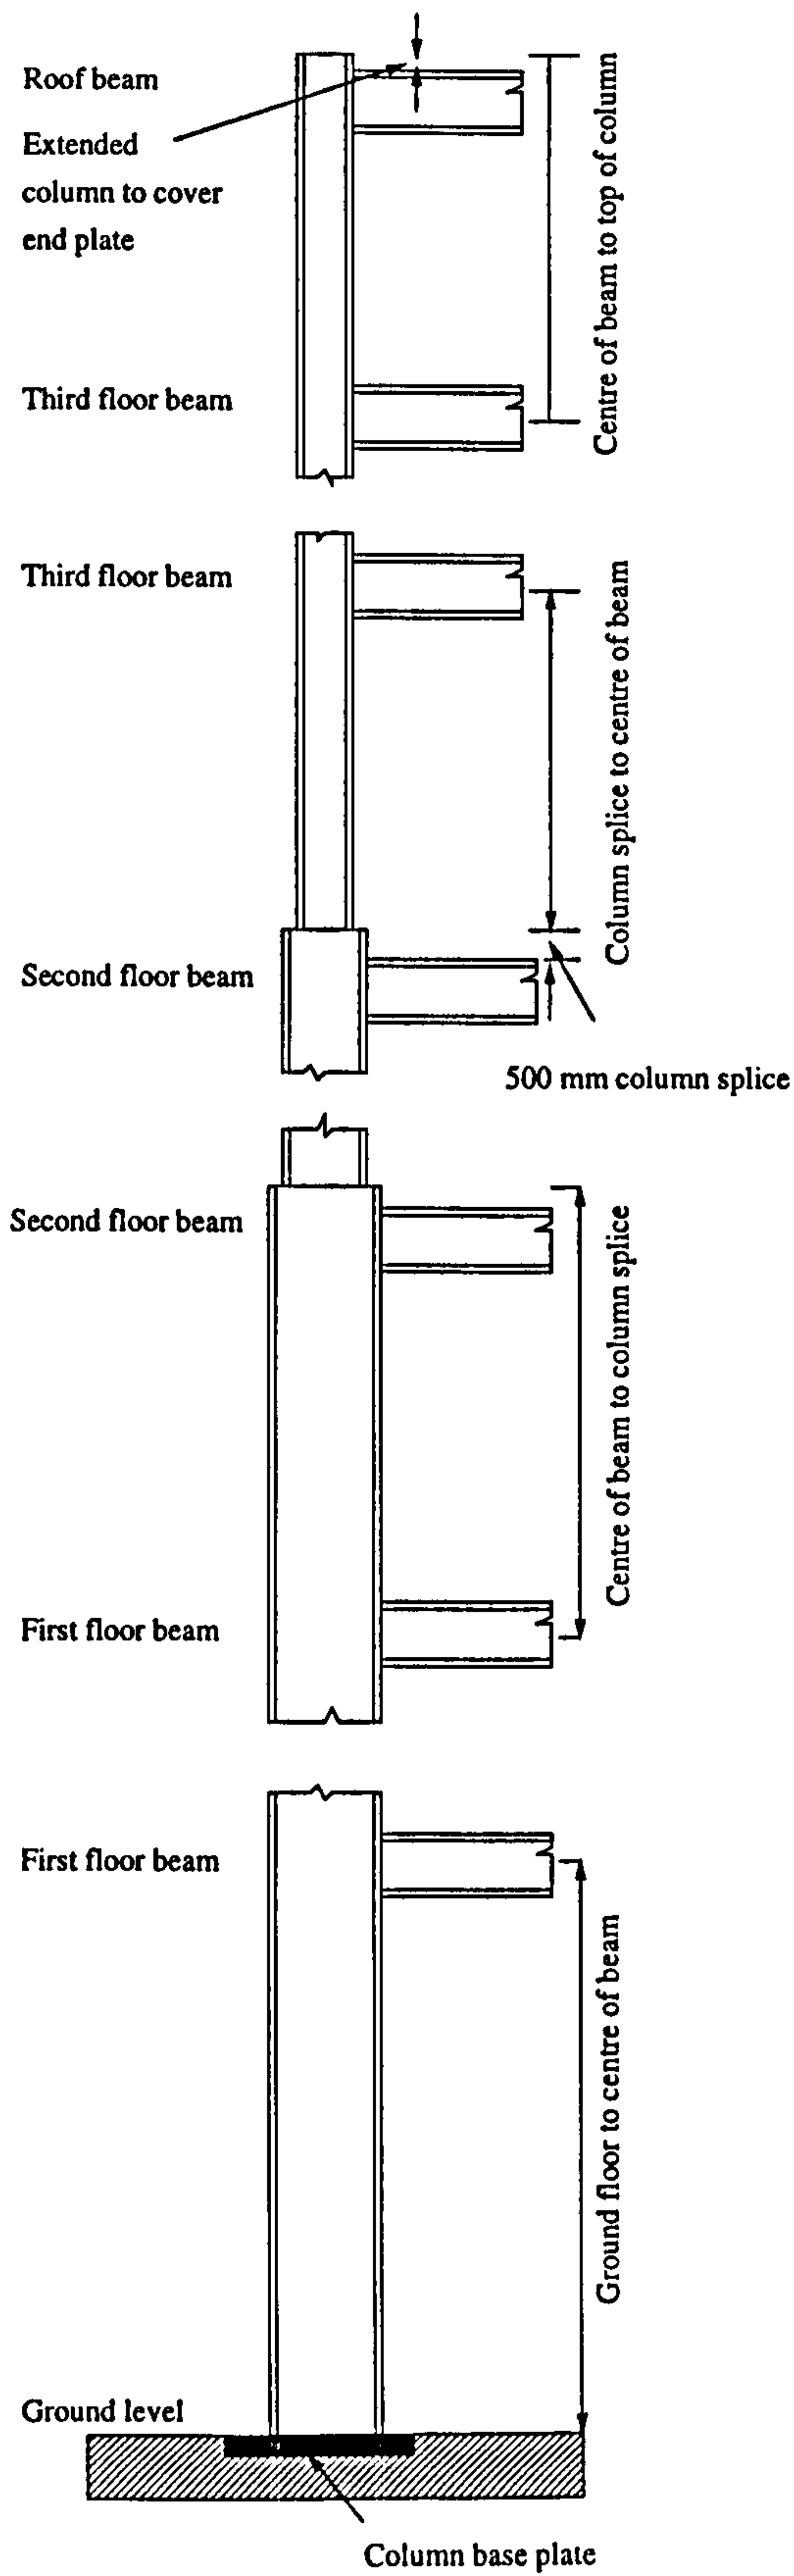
Dimension to calculate total mass of external column for flush end plate connection
